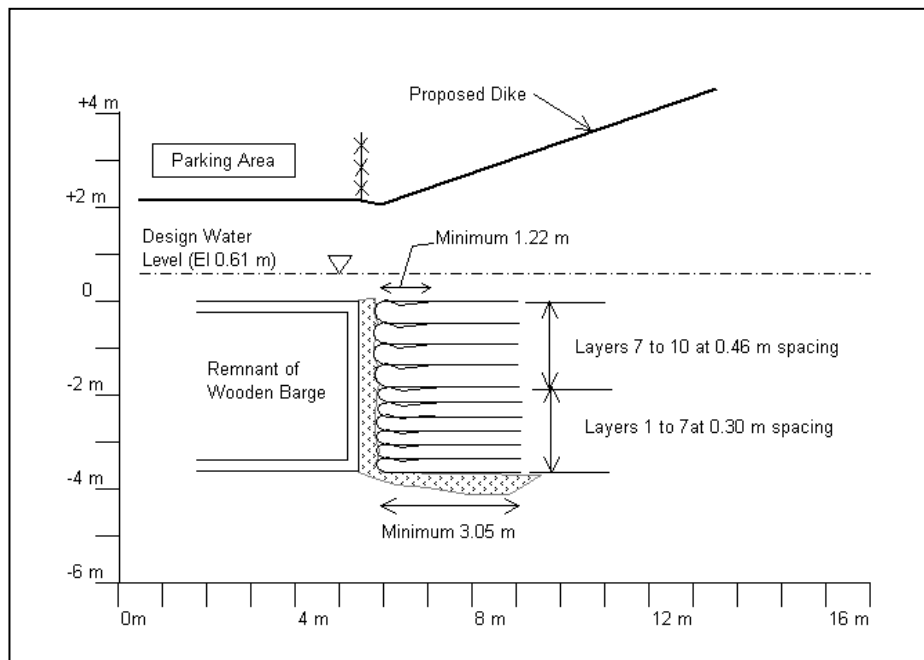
Typical Cross Section of Geotextile Reinforced Slope
